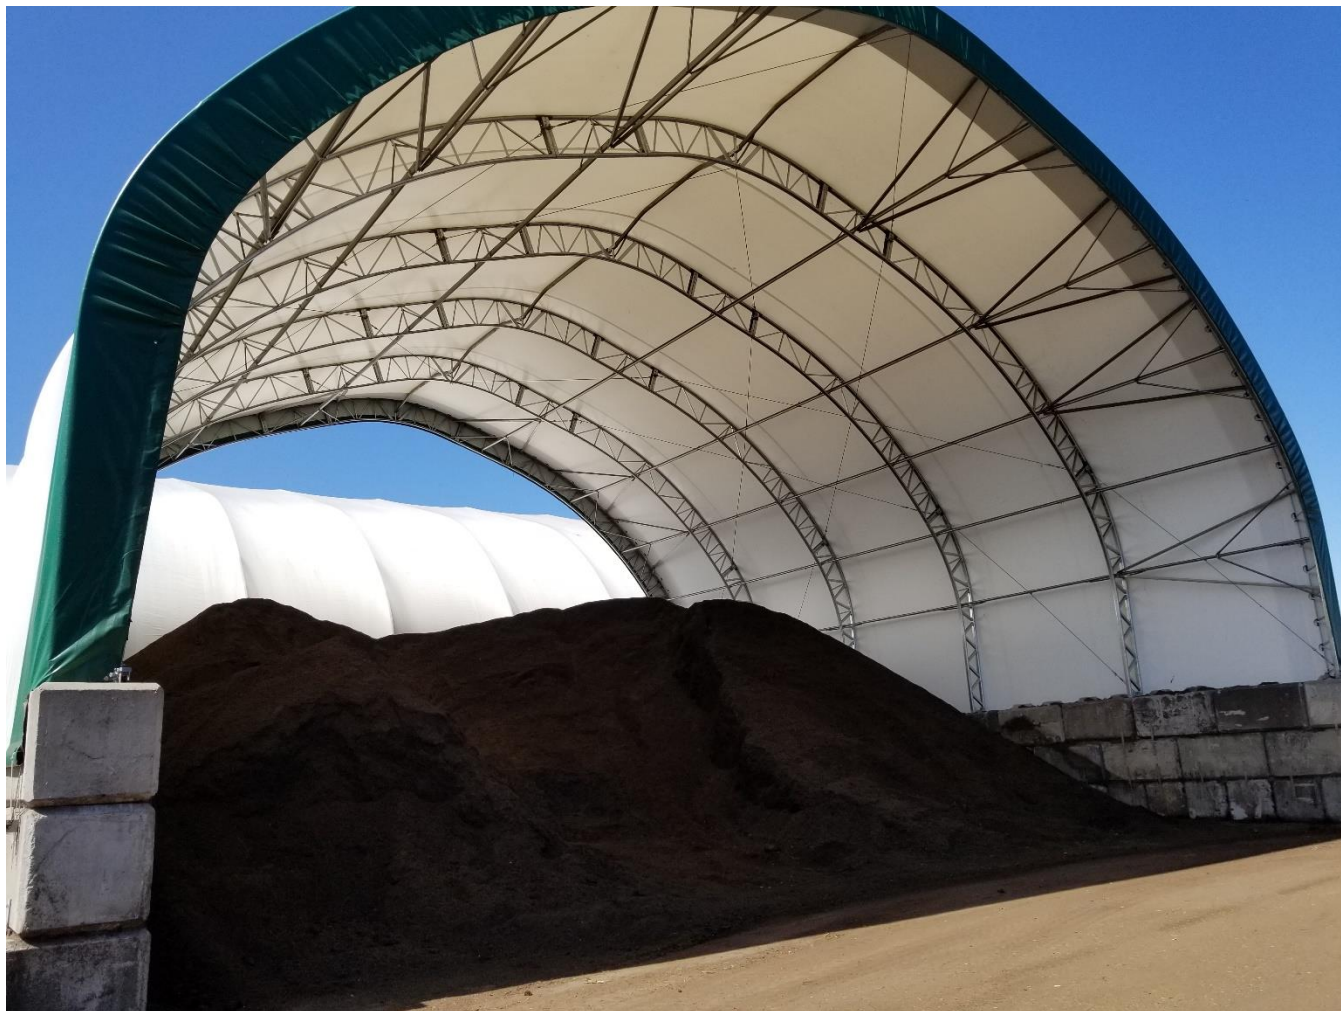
TYPICAL BUILDING FOR STORAGE BUILDING (LOCKBLOCK FOUNDATION) PLEASE REFER TO DRAWING #211 FOR FURTHER DETAILS
